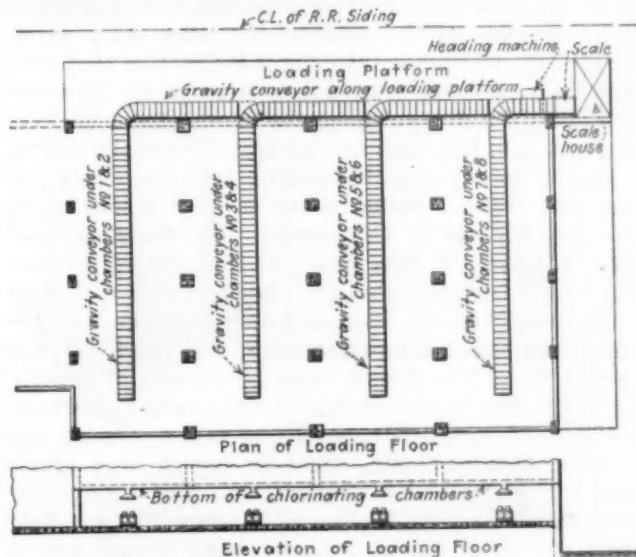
CONVEYING SYSTEM FOR HANDLING FINISHED BLEACHING POWDER
